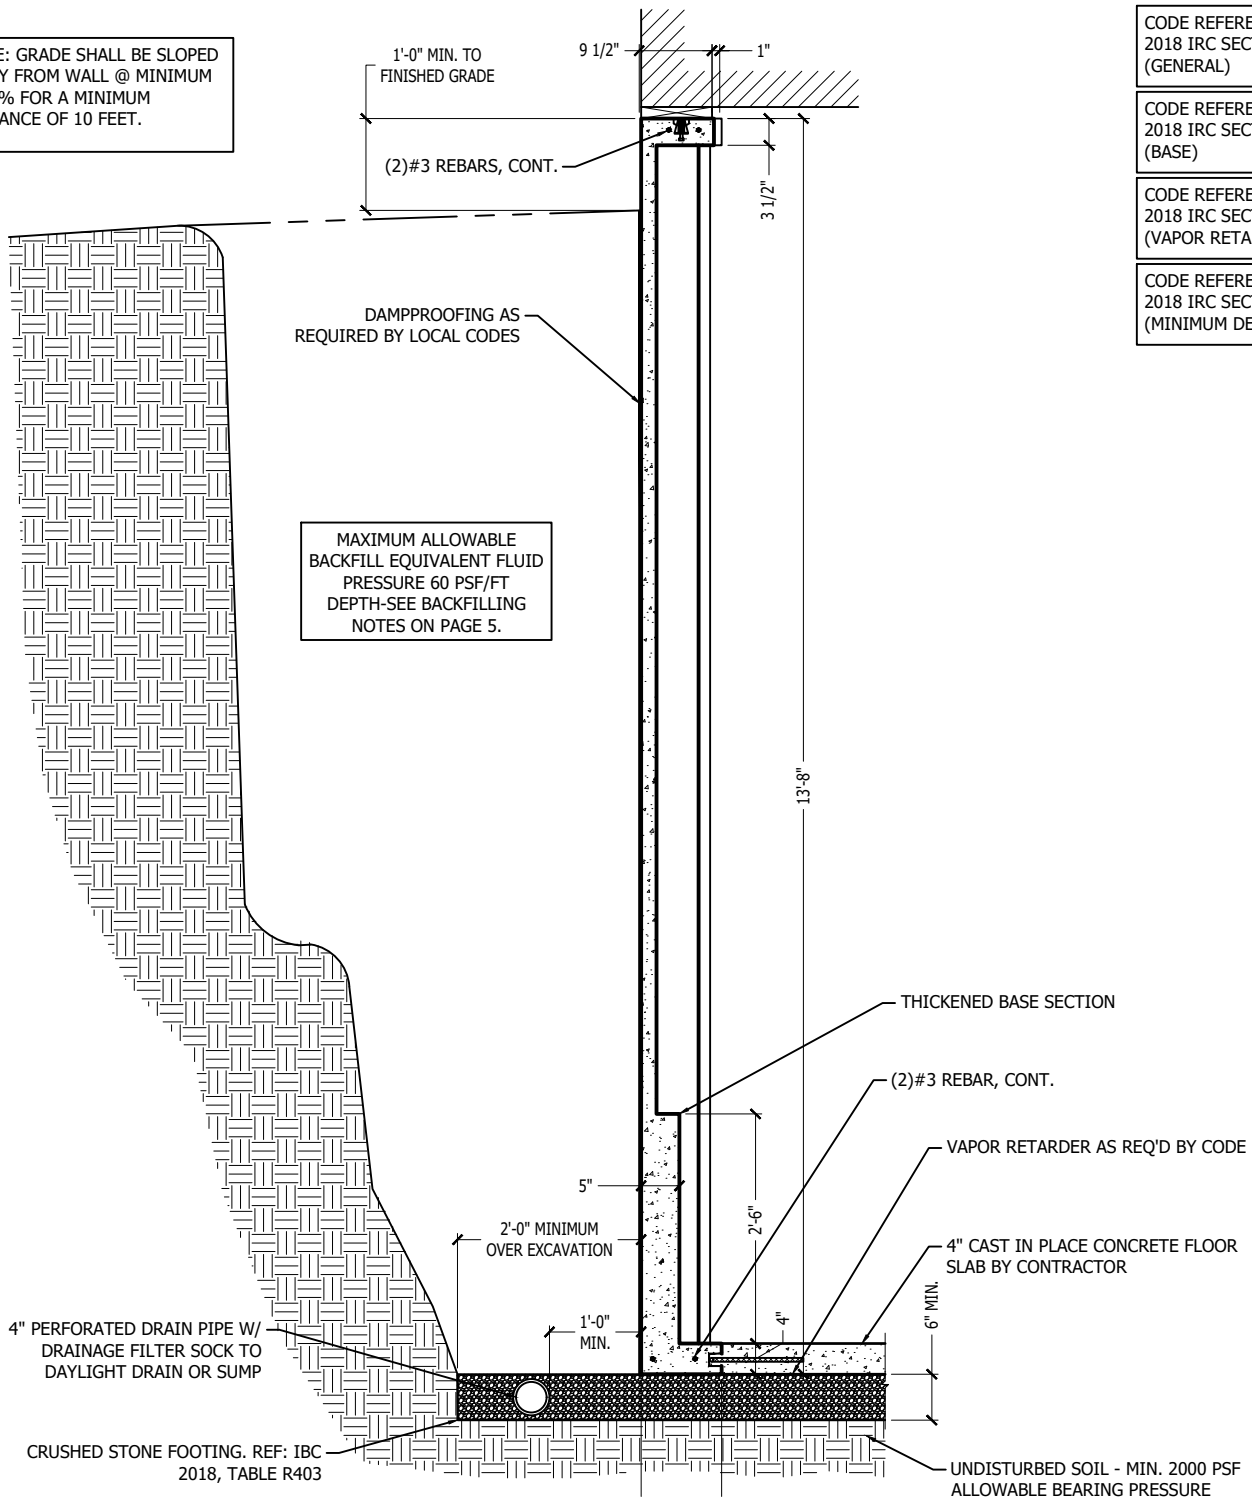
A : TYPICAL WALL SECTION 13'-8" BASEMENT WALL PANELS
